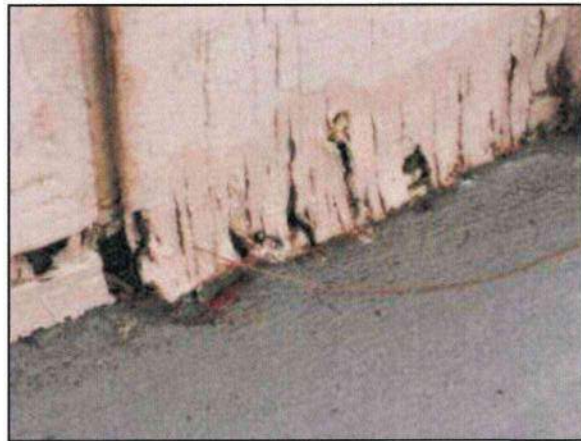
Fire Station #4 Degraded T-111 siding is present near the base where it meets the concrete sidewalk slab.
